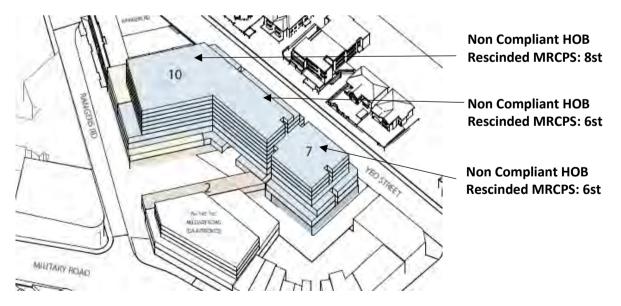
Proposed Massing Diagram (Applicant's Urban Design Report, p. 28)
